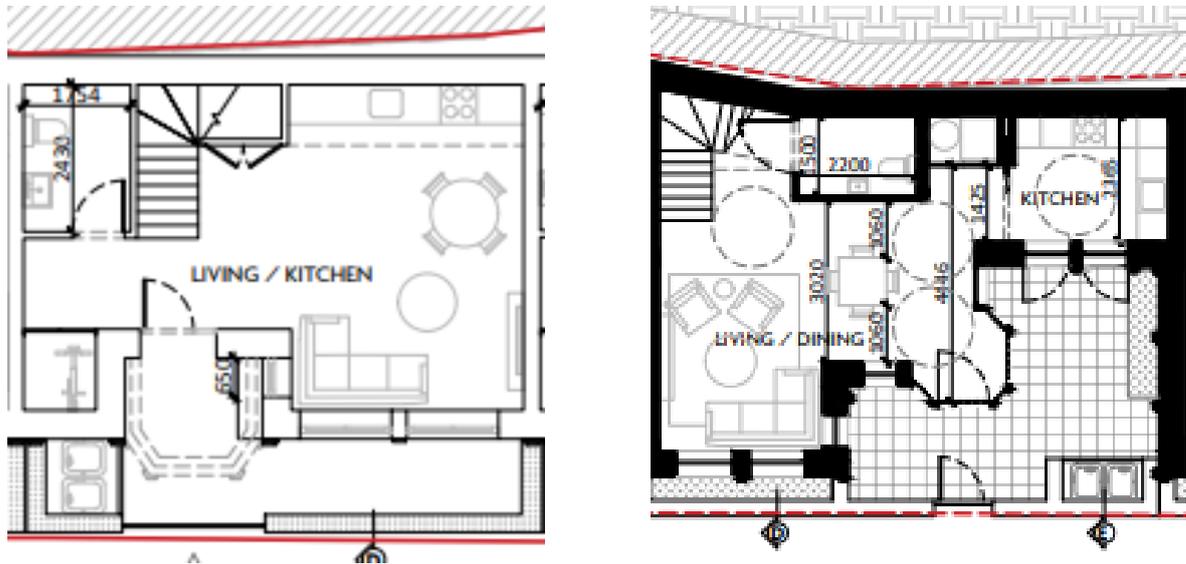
and 23: Proposed Ground Floor for House 3 (left) from the refused scheme (Ref. P2021/3101/FUL) and House 2 within this scheme (right)
